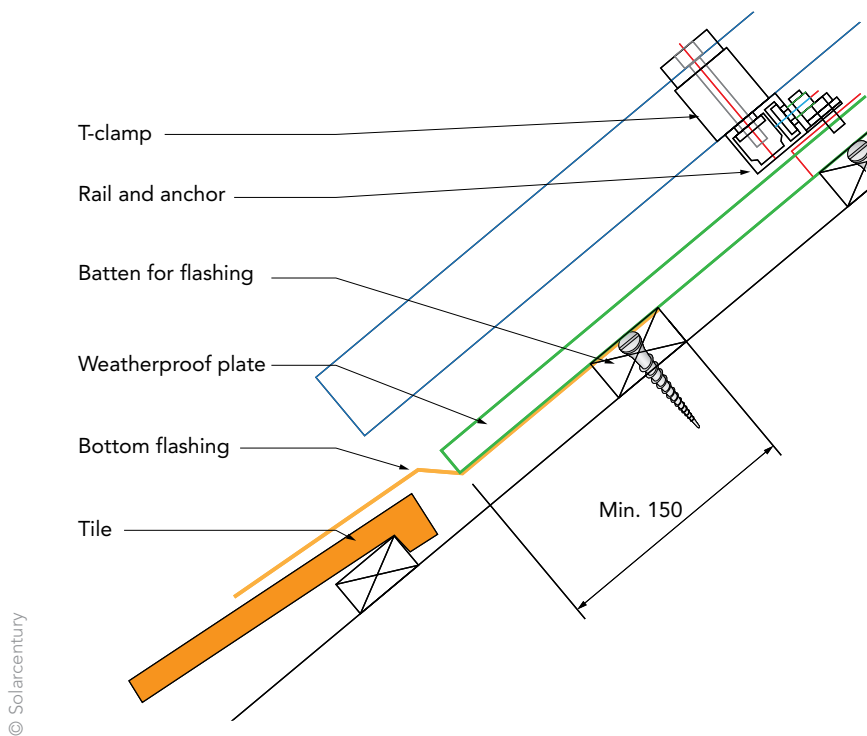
Typical bottom flashing detail for a module system with backing plates.
